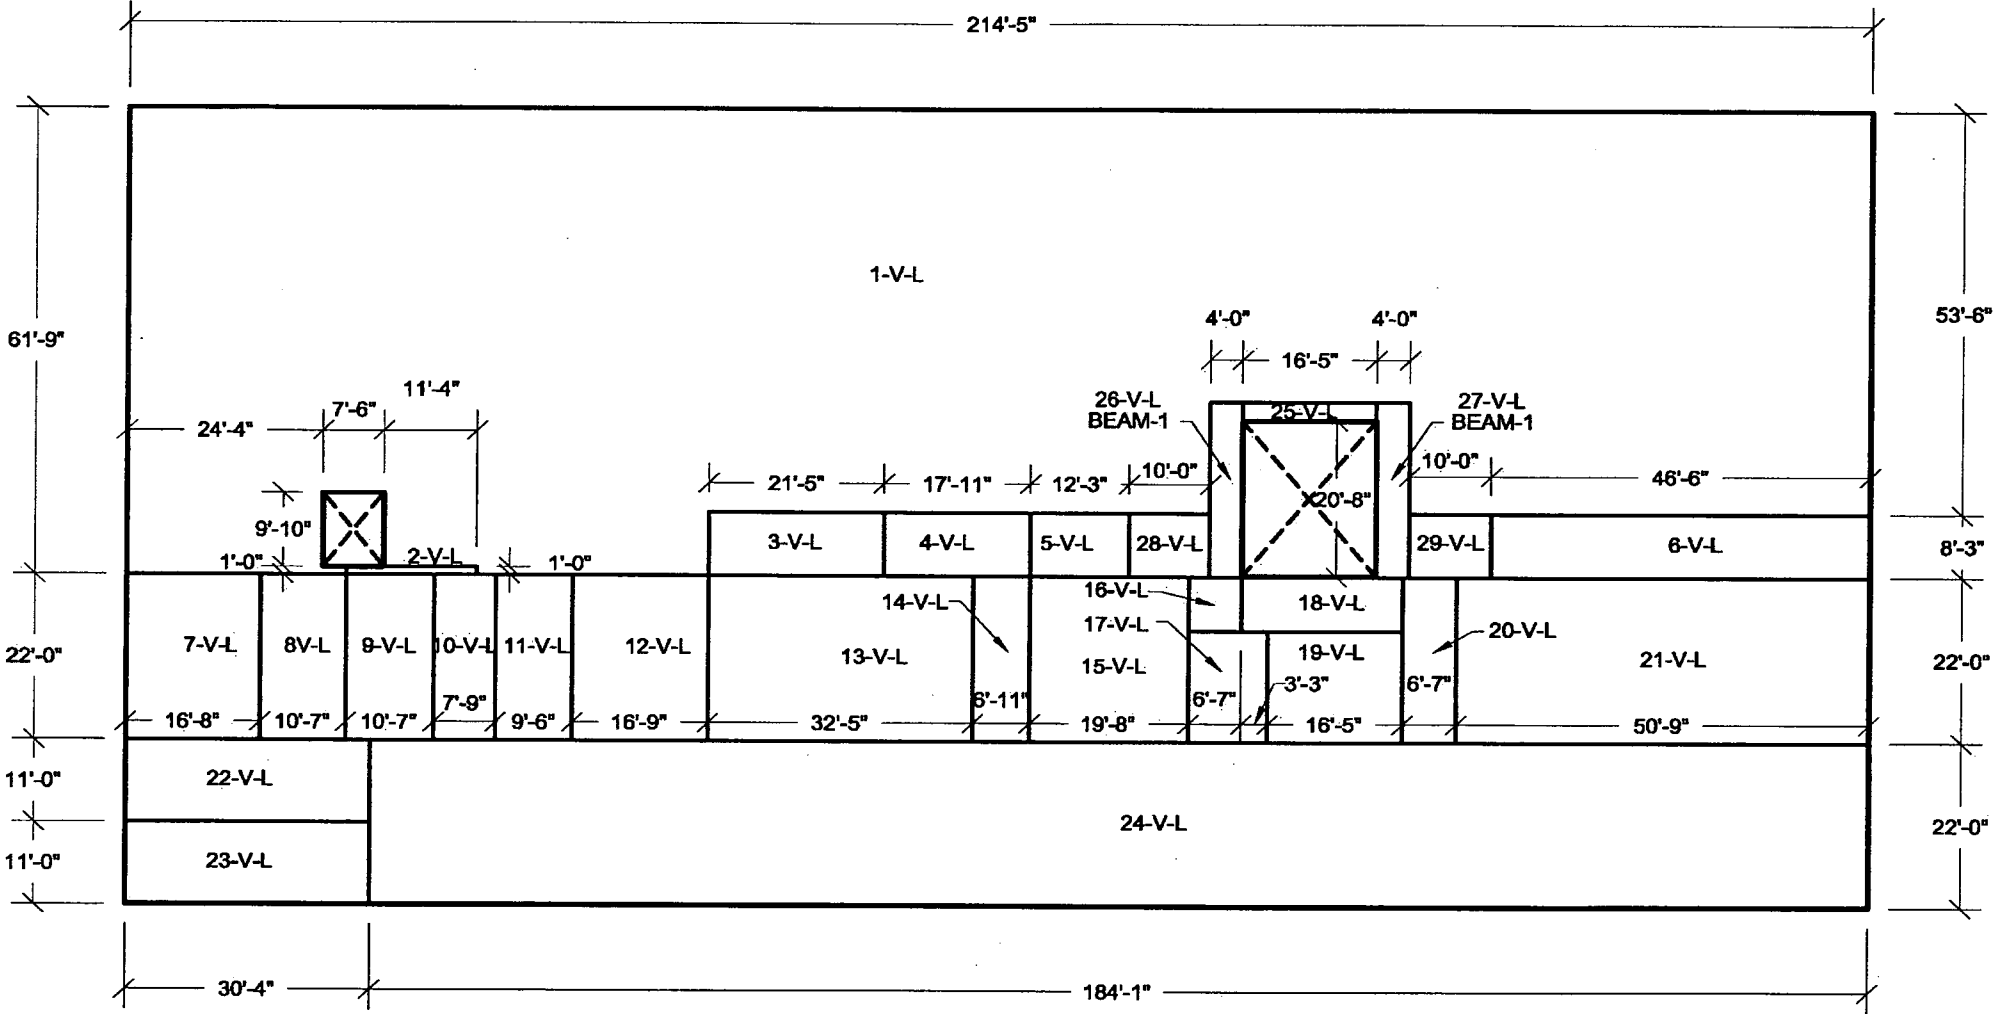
H.3-9: NORTH WALL LOOKING SOUTH
